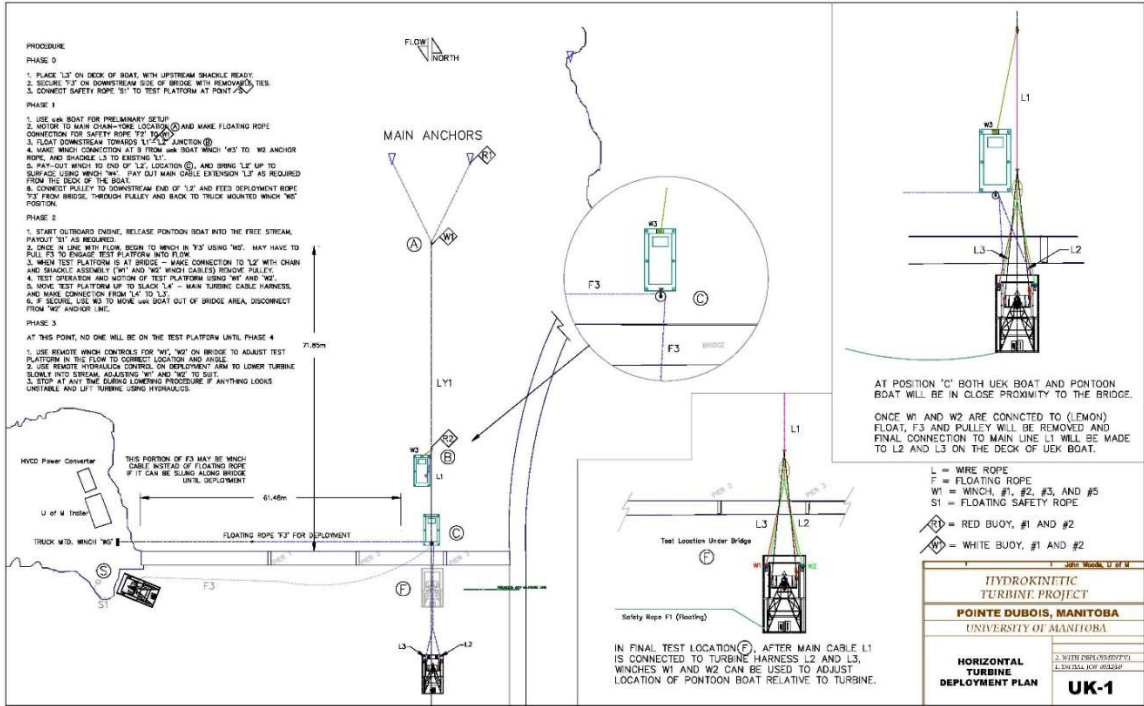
Plan for deployment of horizontal-axis turbine, using vessel-mounted pulley on main anchor cables and shore winch. Appendix 1 shows a full size plan.
